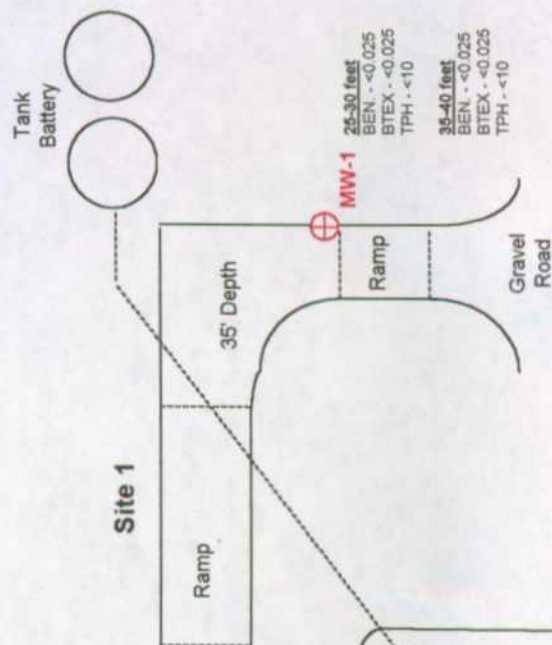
SITE PLAN (EXPLODED VIEW)
